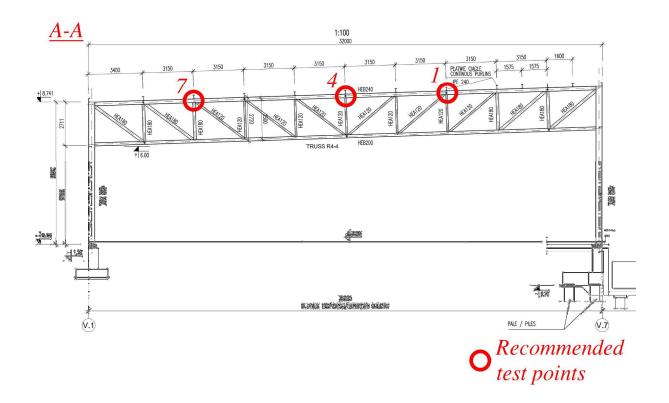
Examples of recommended test points in a slender roof structure, at cross section A-A (see Figure 4.3).
